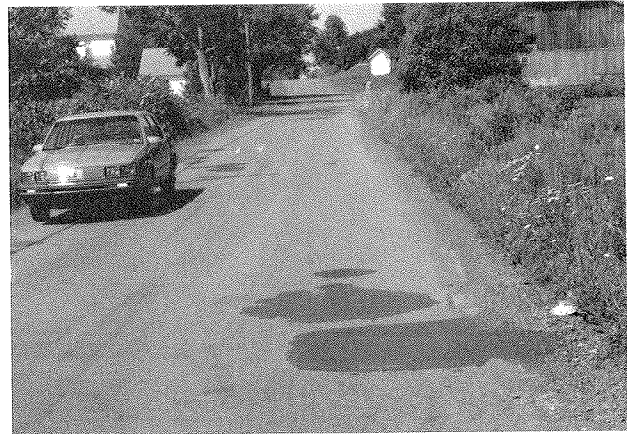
Potholed section of roadway on the Luzerne County project in which 100% recycled asphalt pavement was used.
